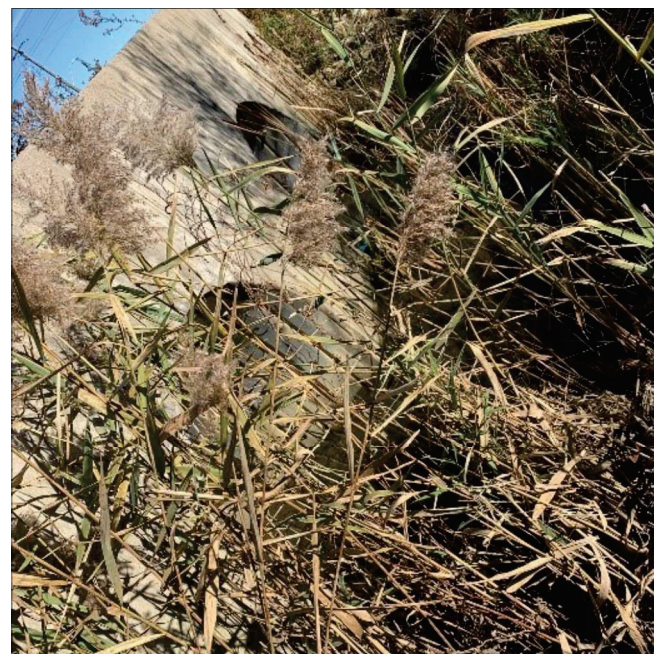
Watercourse Crossing 6, large culvert and concrete headwall conveyed under CR 46.
